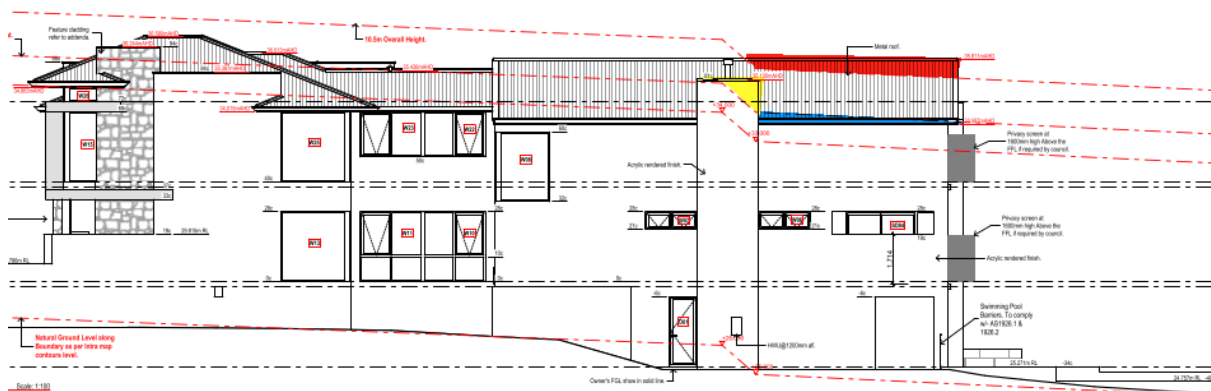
Eastern Elevation of 8 Cowrie Crescent. The areas subject of this assessment are highlighted as follows: Eave height in blue, concealed roof in yellow and maximum in red
